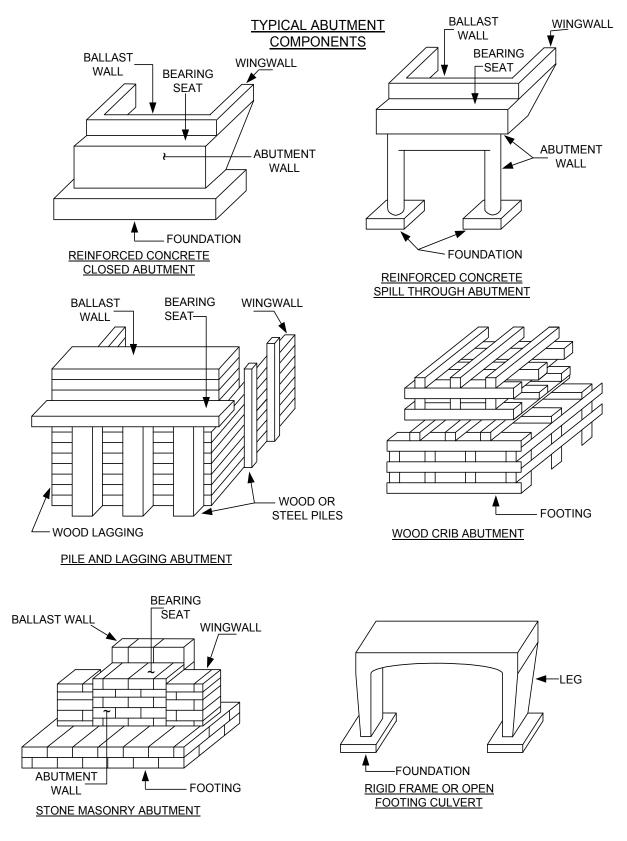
(a) Typical Shallow Foundations (cont'd)
